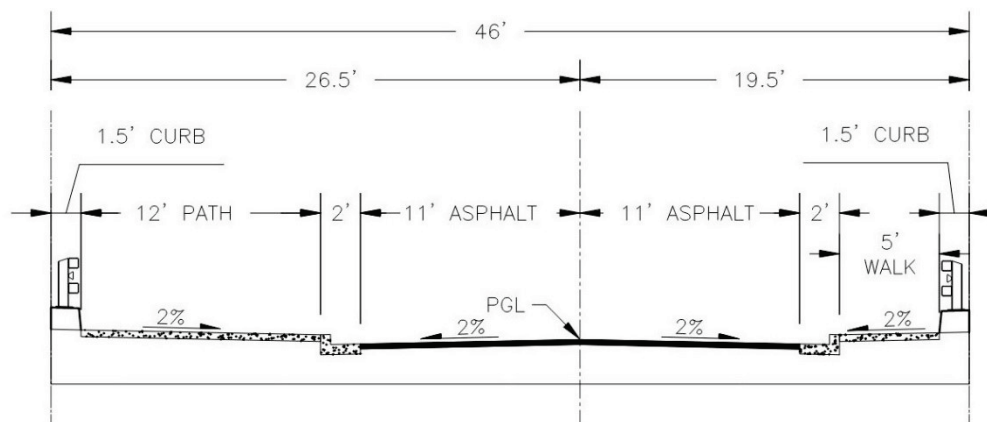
Proposed typical section Bridge MESA-E.5-29.8
